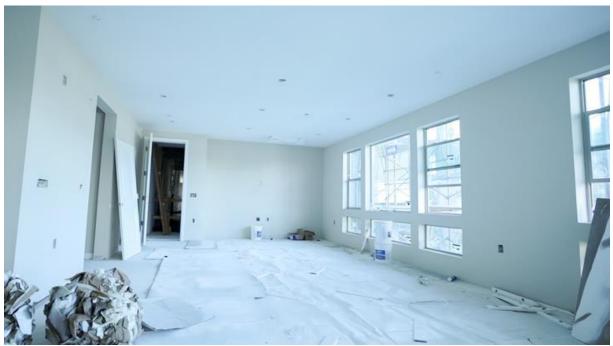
This 5 storey prefabricated lightweight framed apartment building utilised a pourable Gypcrete floor topping to counter airborne noise transfer.
